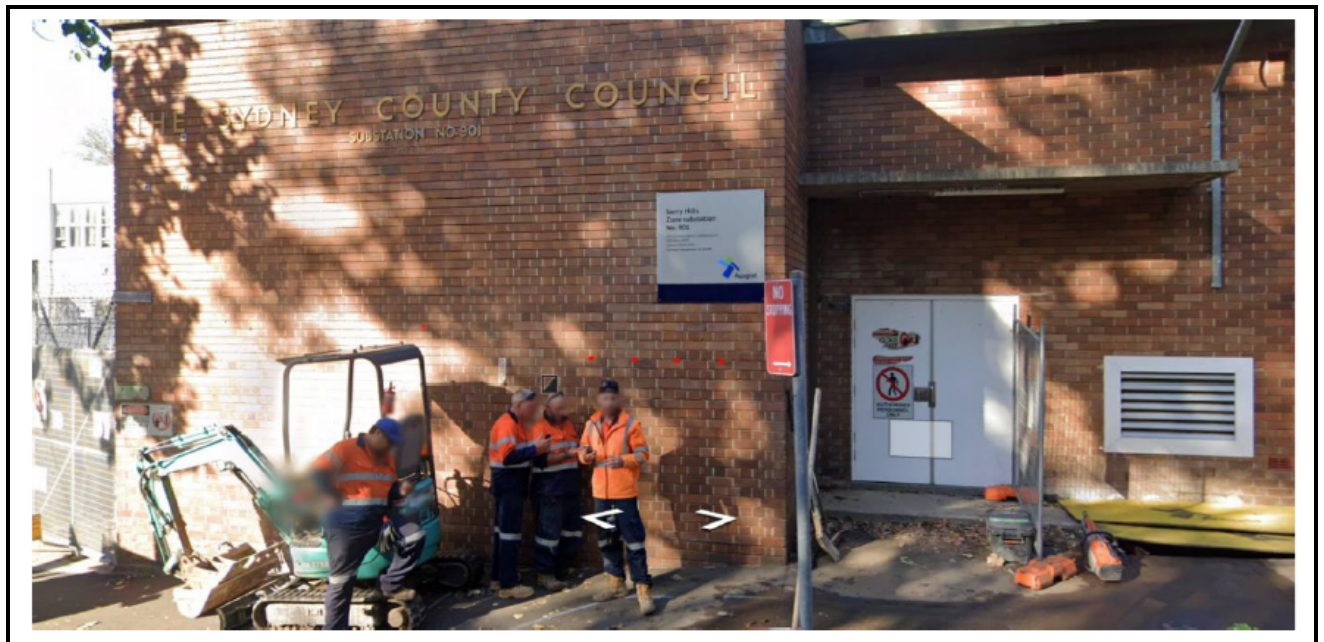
Surry Hills Zone Substation adjacent to Site (Source: Google)
